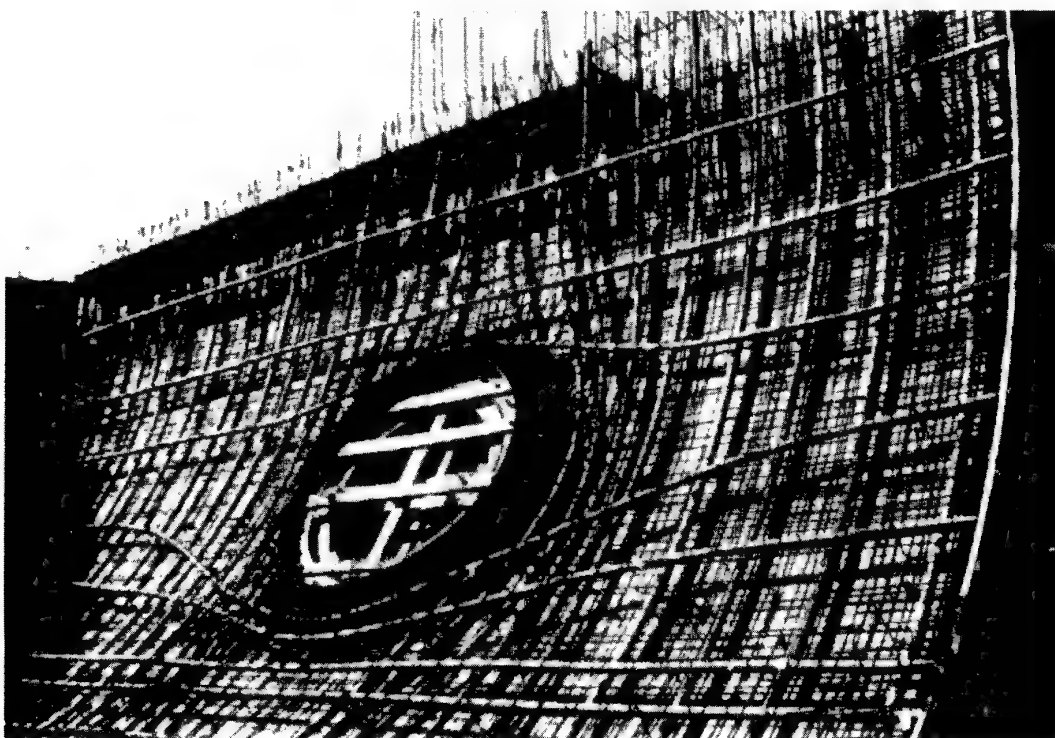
Sleeves of pre-stressing cables around on access door in the pressure shell of the ONERA F1 tunnel
